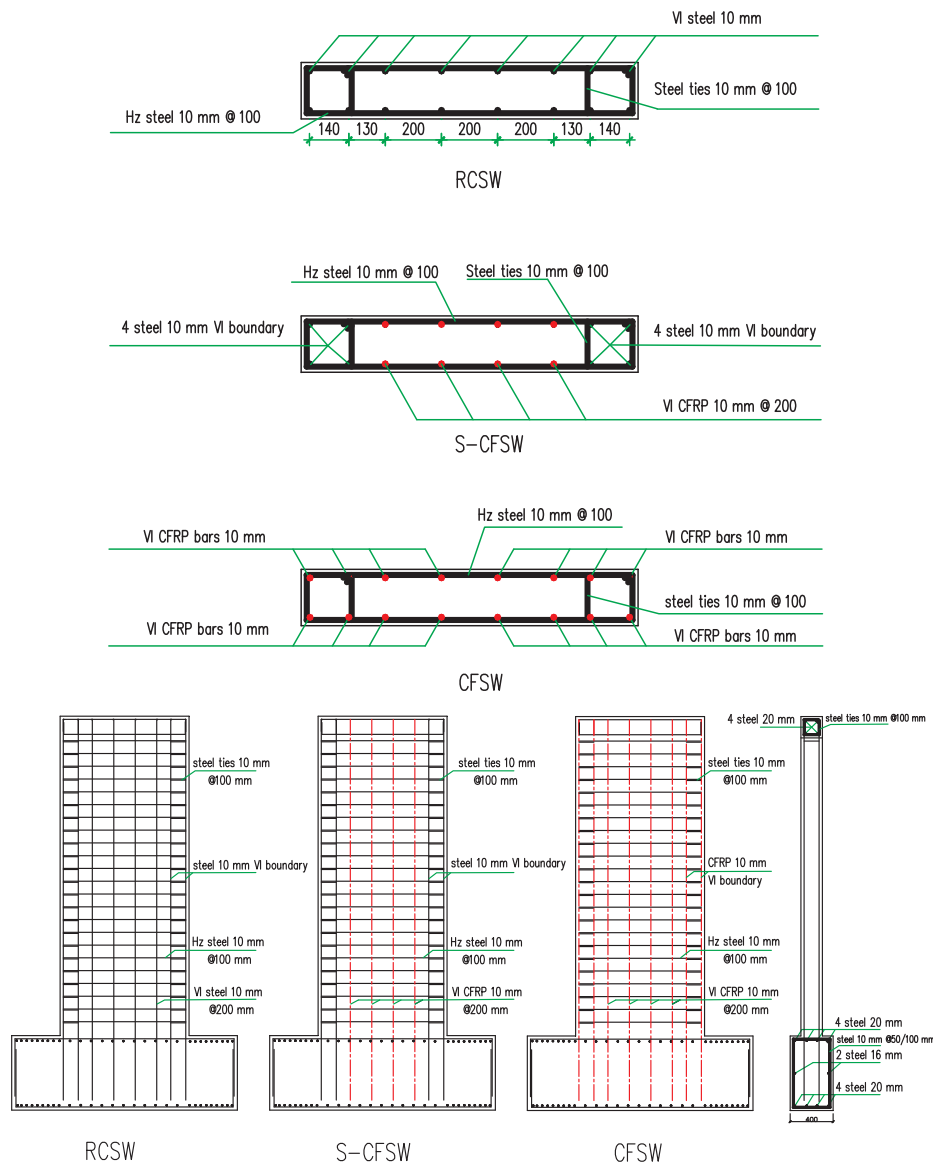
Detailed information of reinforcement. *Notes:* VI denotes vertical reinforcement and Hz denotes horizontal reinforcement. For example, “Hz steel 10 mm @ 100 mm” means horizontal steel bars with 10 mm in diameter and a spacing of 100 mm.
